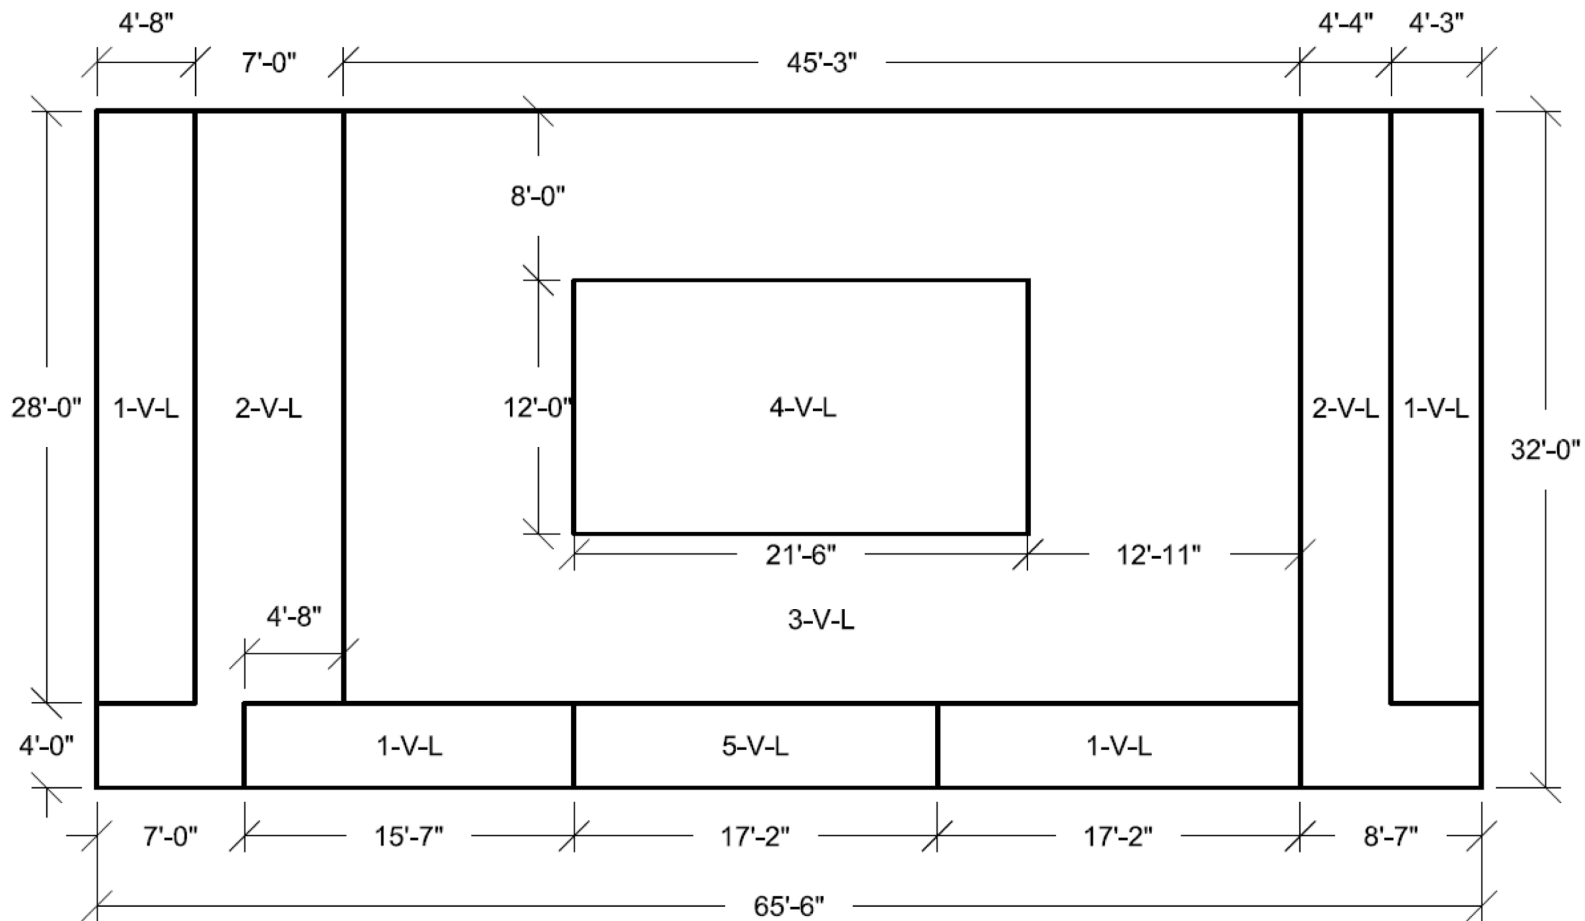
H.6-171 DGFOSV Wall 8 Looking From Outside
